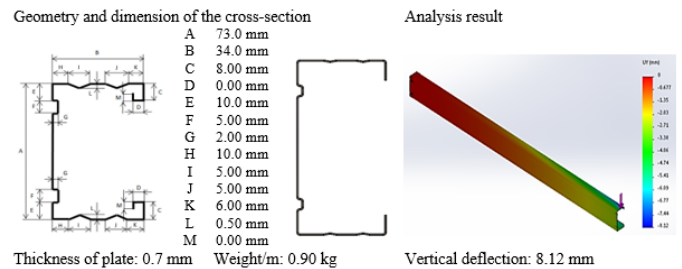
Cross-section geometry and dimension of C70 profile SNI-1729:2015 [1]
